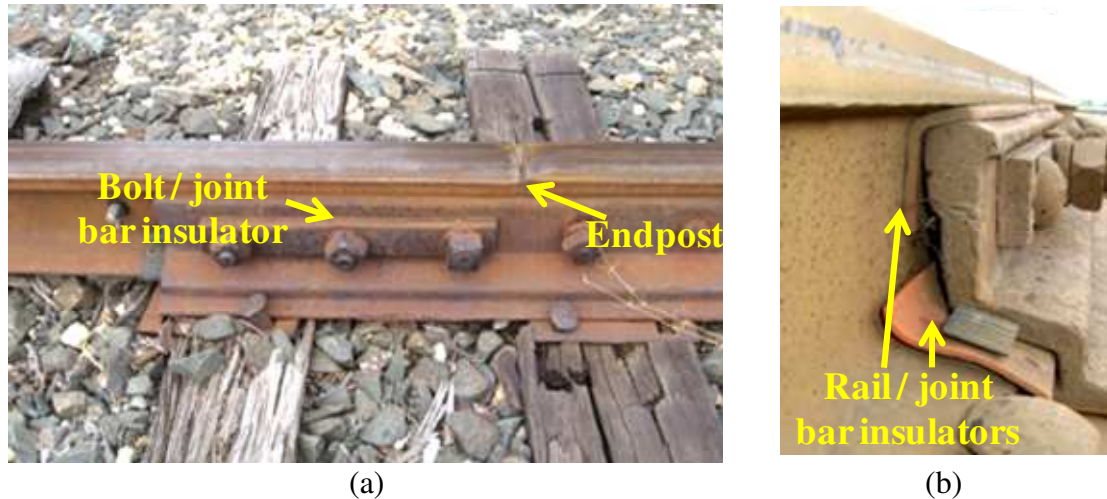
Typical bolted insulated joint. (a) Side view, showing endpost (insulator between rails) and insulator between bolts and joint bars. (b) End view, showing insulator between rail and joint bar.
